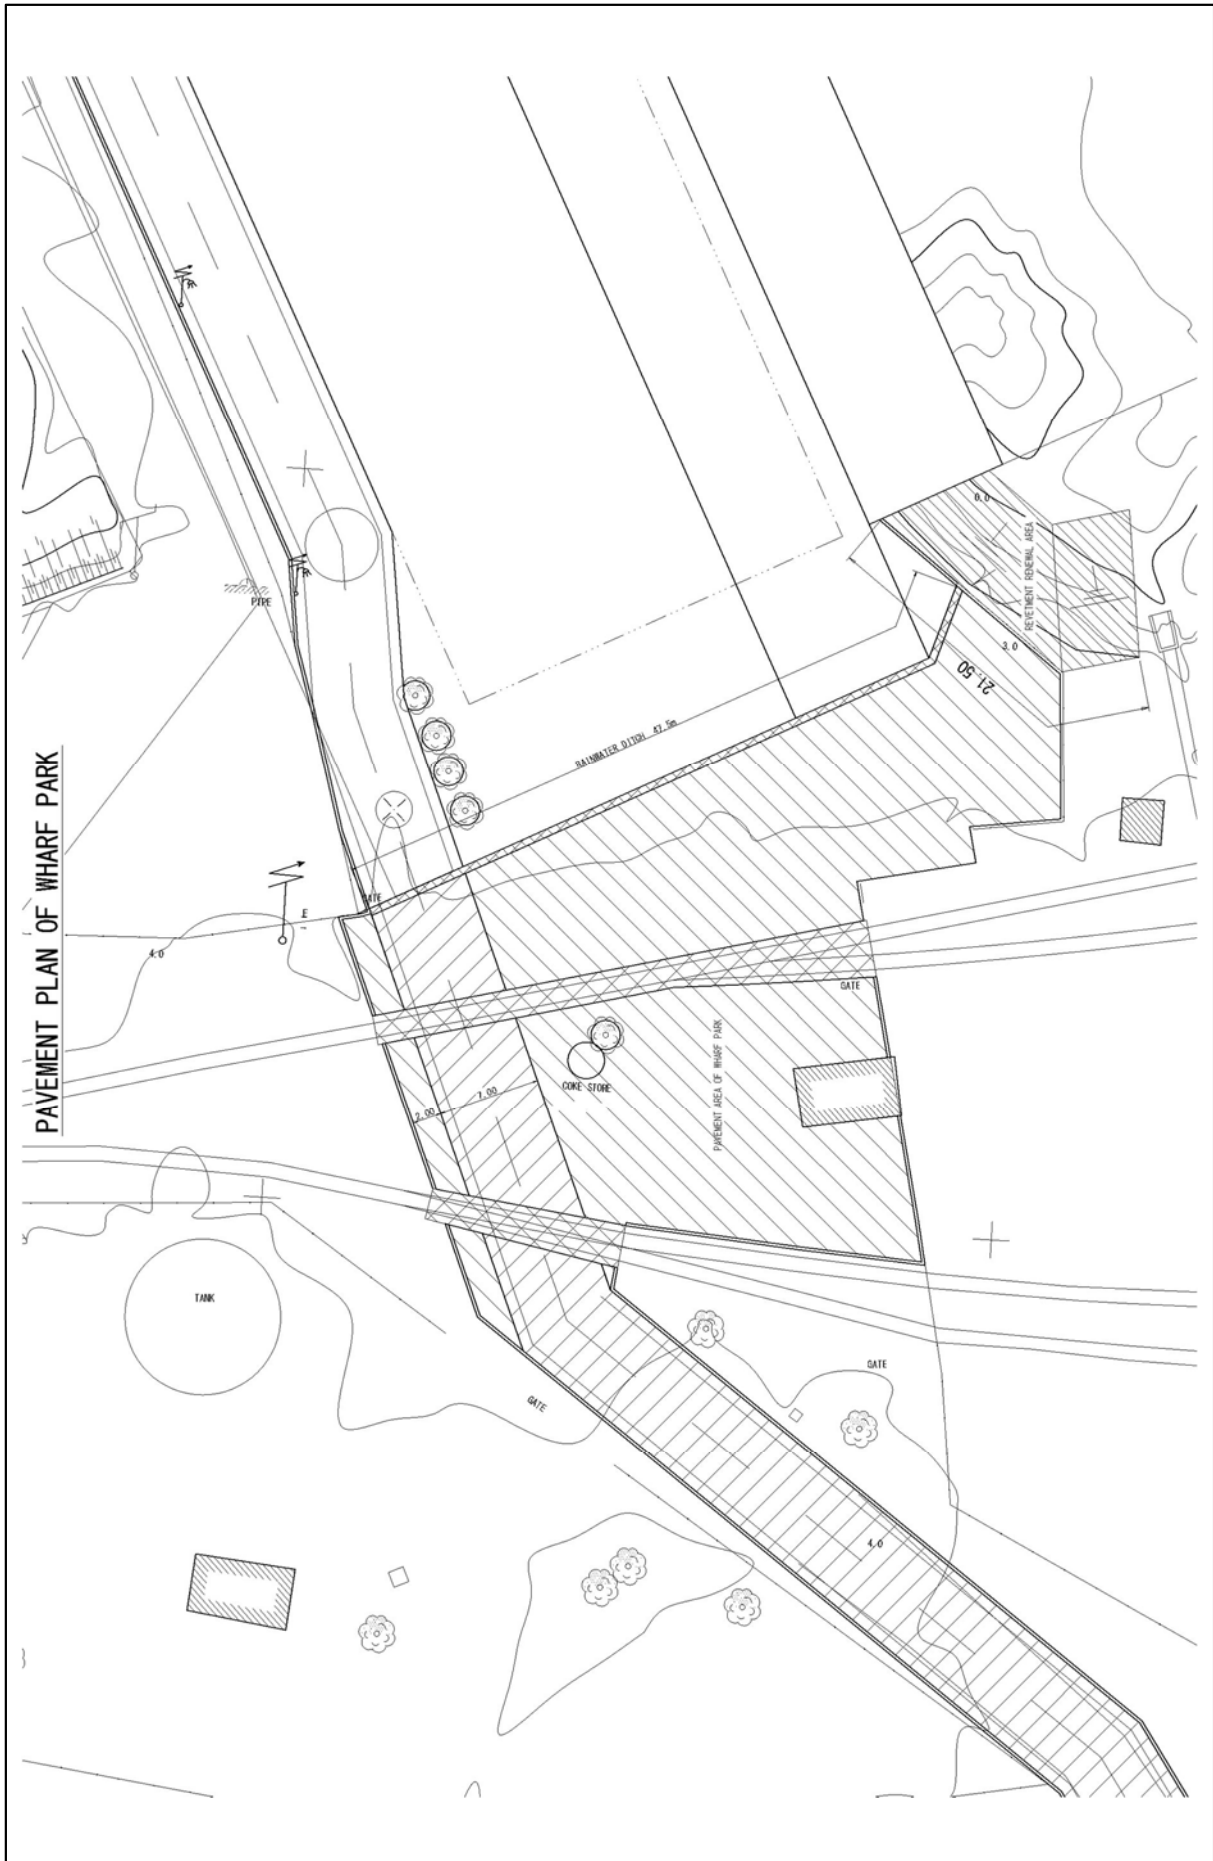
Pavement Plan of Open Space in front of Wharf
